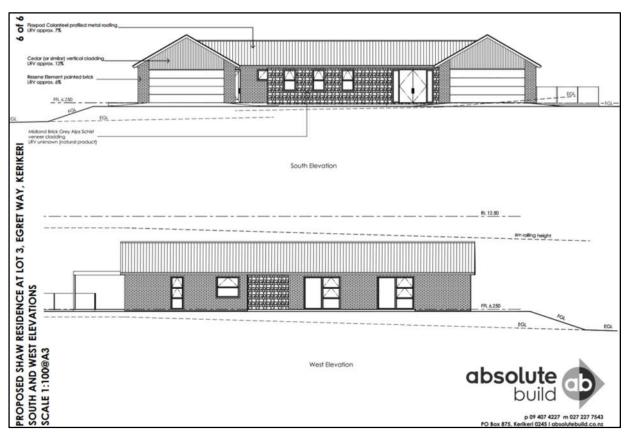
Elevations showing the proposed dwelling with existing/proposed ground profiles.
